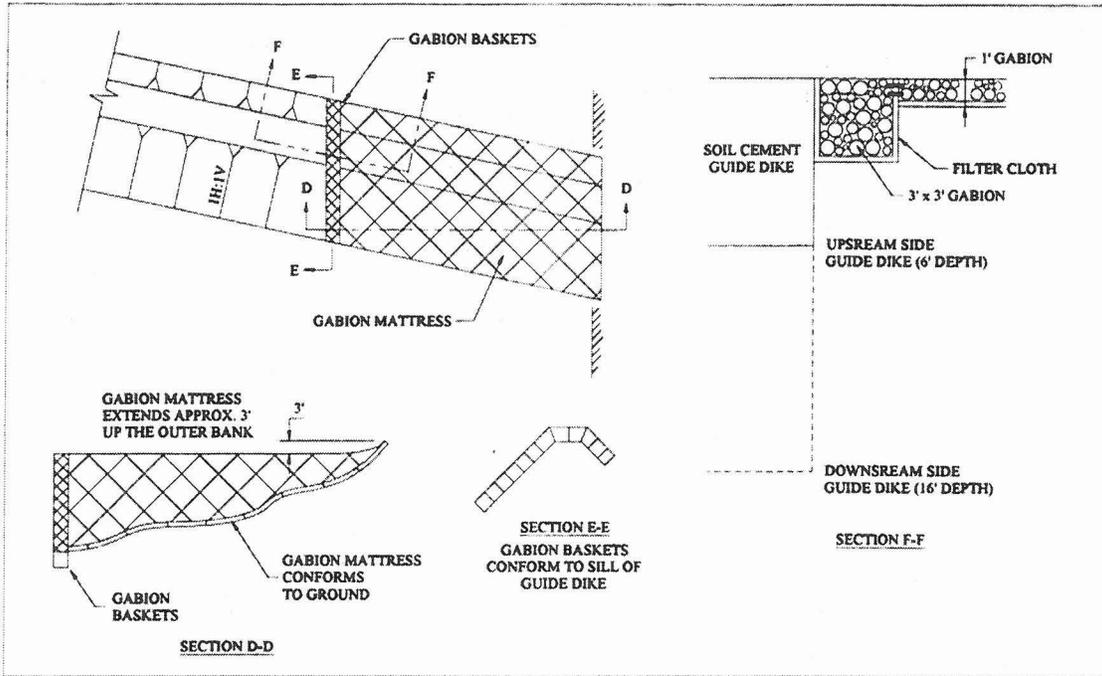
Plan view of revised guide dike design, end detail for transition from soil cement to gabions near outer bank.
